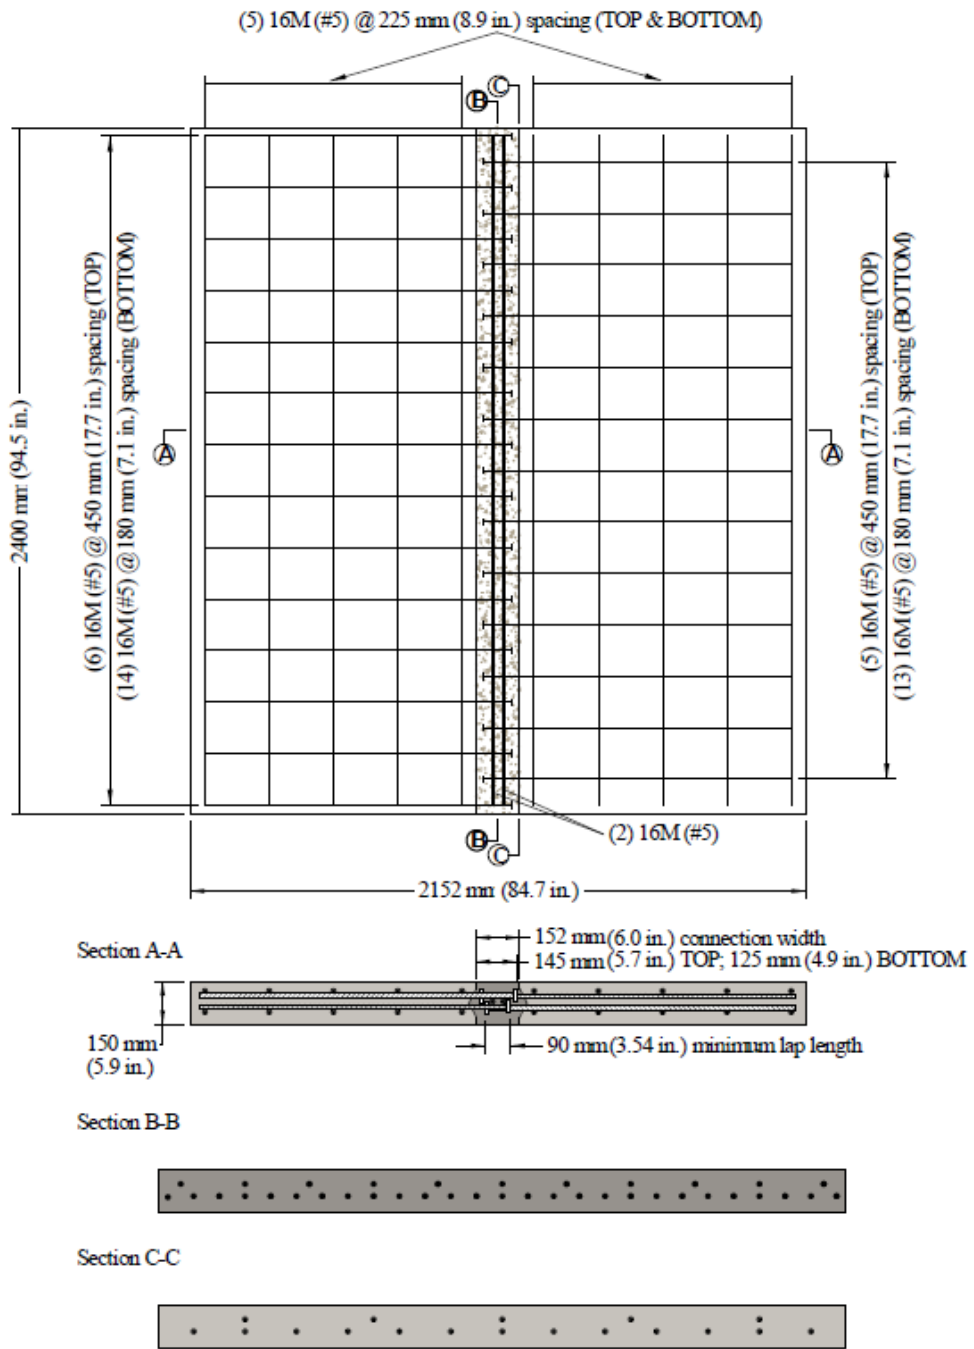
Layout and Rebar plan for Concrete Panel 6H (Graybeal, 2010)
